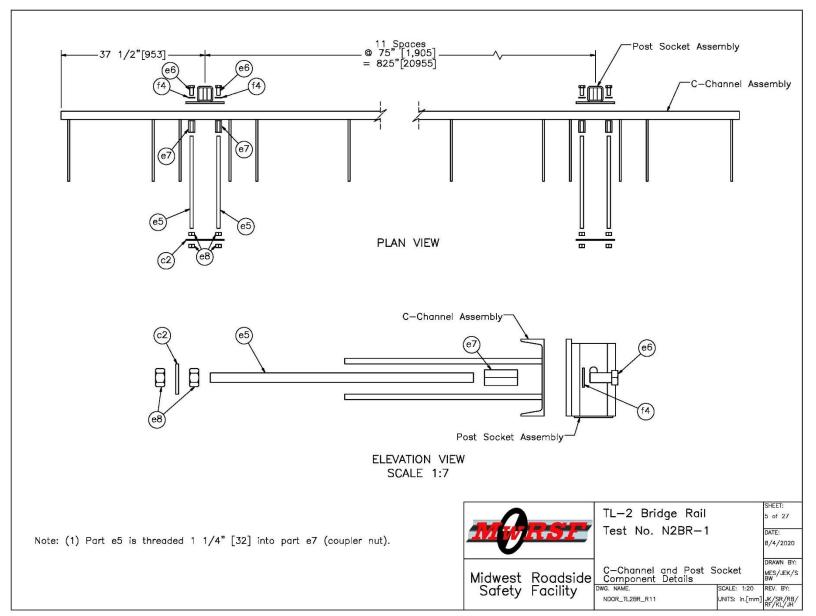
C-Channel and Post Socket Component Details, Test No. N2BR-1
